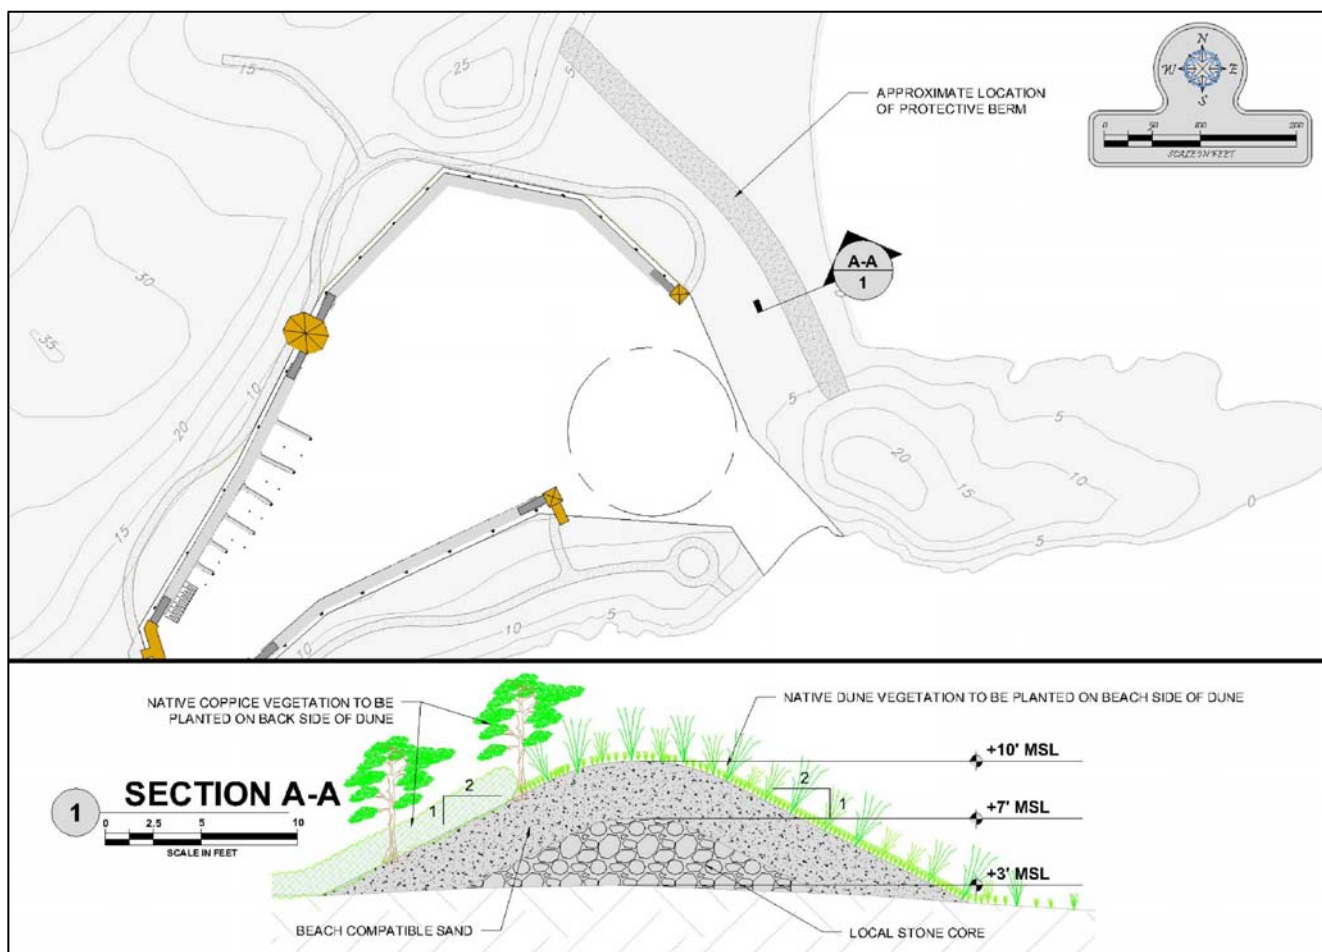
Created Dune Plan and Cross-section (Exhibit 9)
